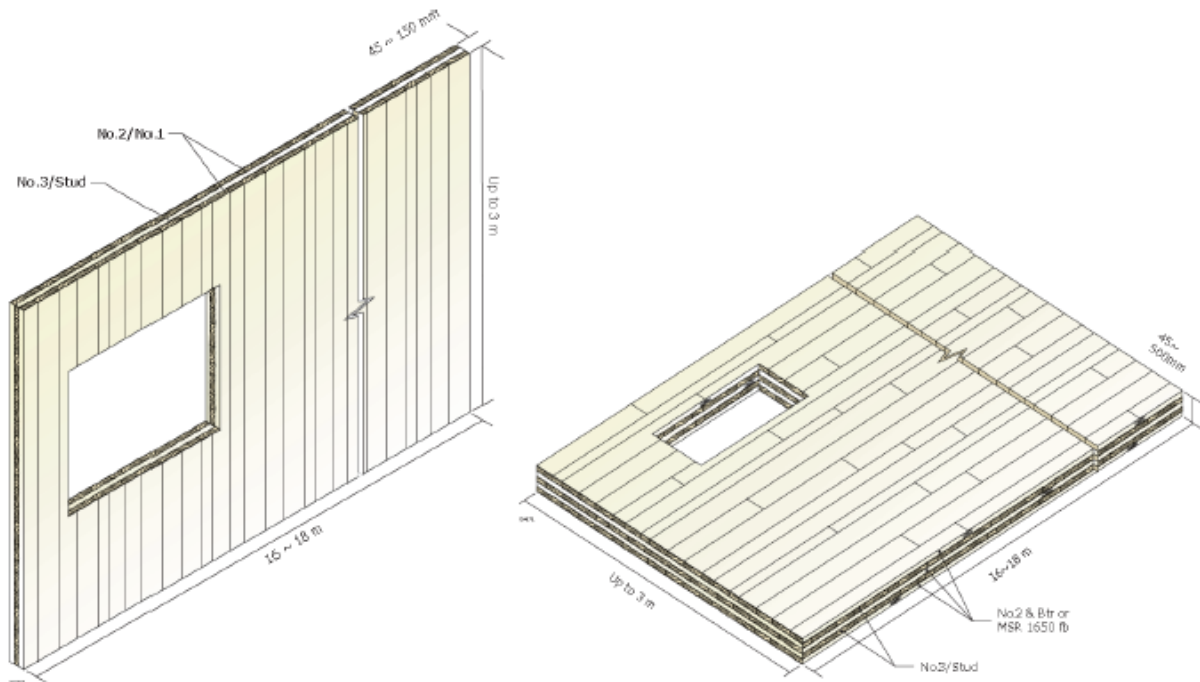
Examples of prefabricated wall and floor CLT elements (Gagnon & Pirvu, 2011).
